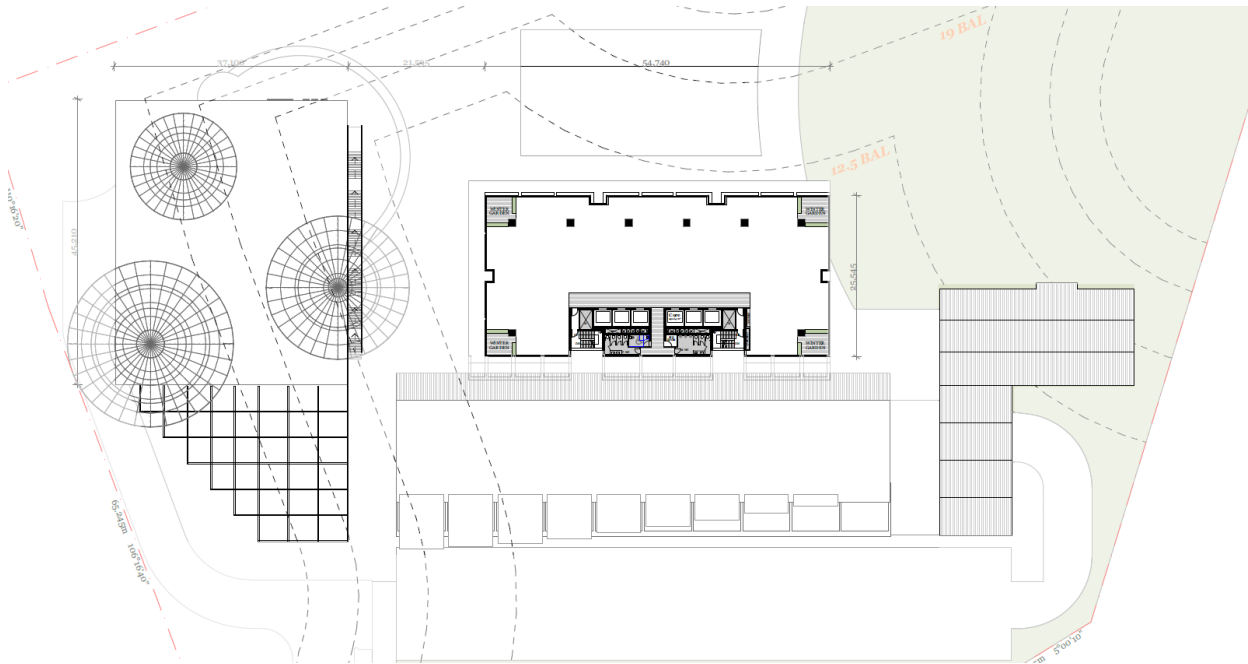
Extract of the typical commercial tower plan, levels 8- 9 and 15- 16 (Source: DKO Architecture)
